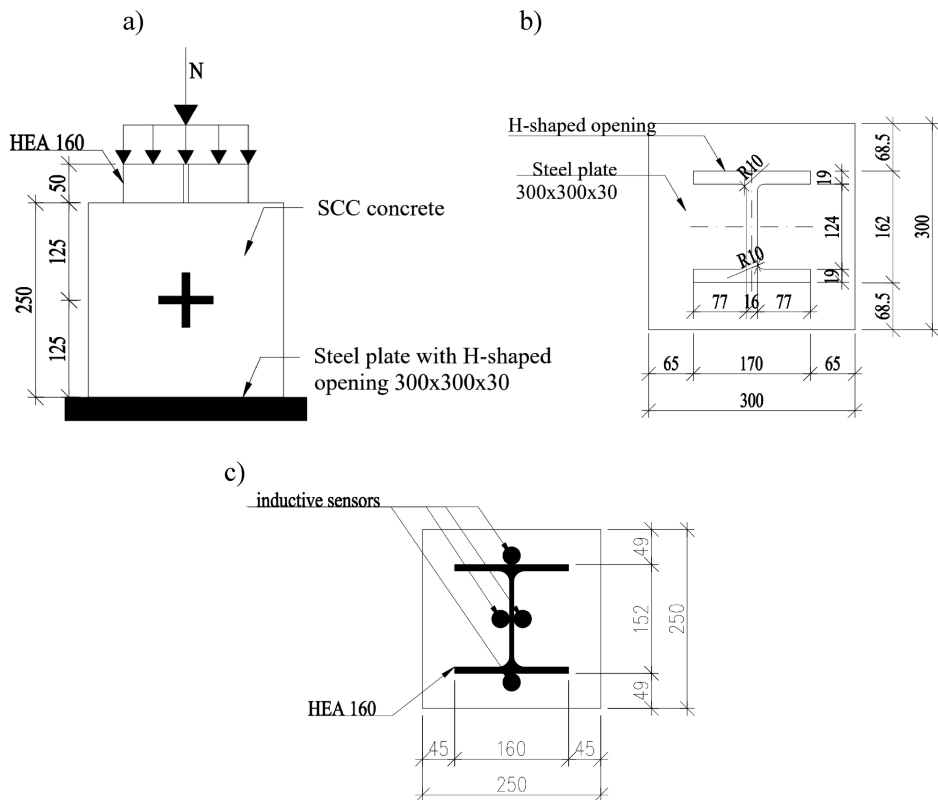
The scheme of: a) test stand, b) H-shaped opening in the steel plate, c) the arrangement of inductive sensors
